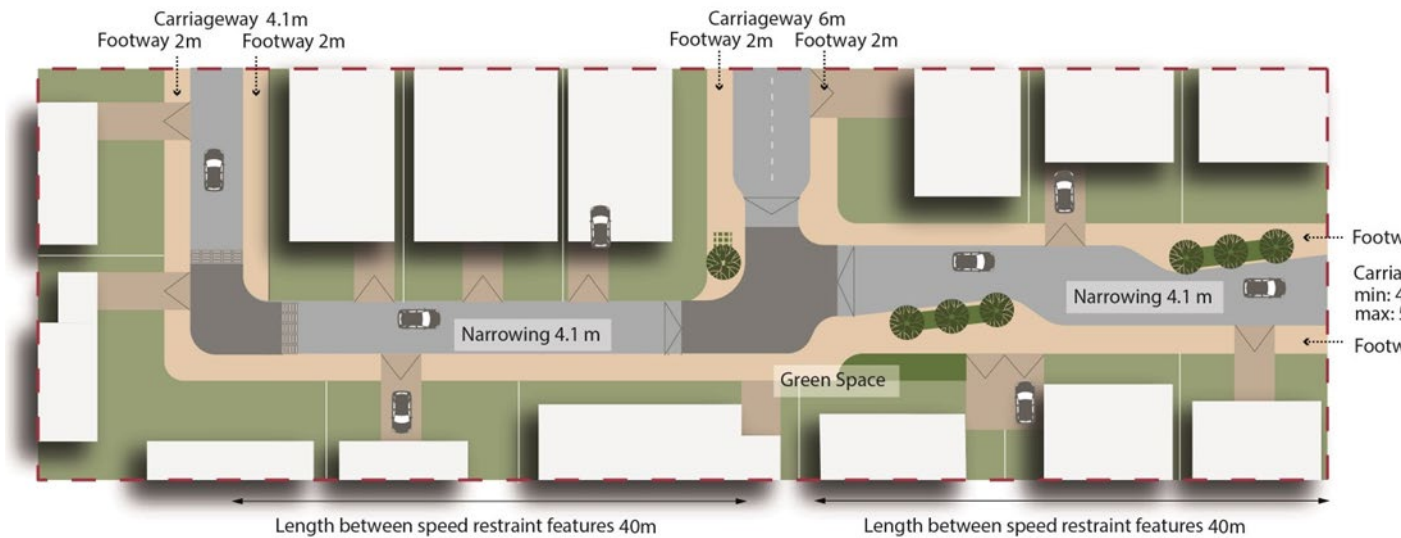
Street Typology Plan for a Residential Link Street in a Rural Context
